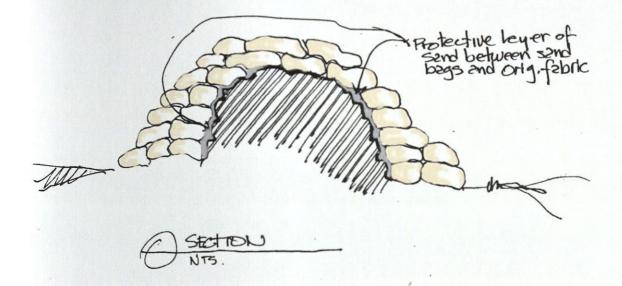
A sketch of a low wall showing the use of sand bags to protect it. This wall would be similar to the walls of Figure 1.
